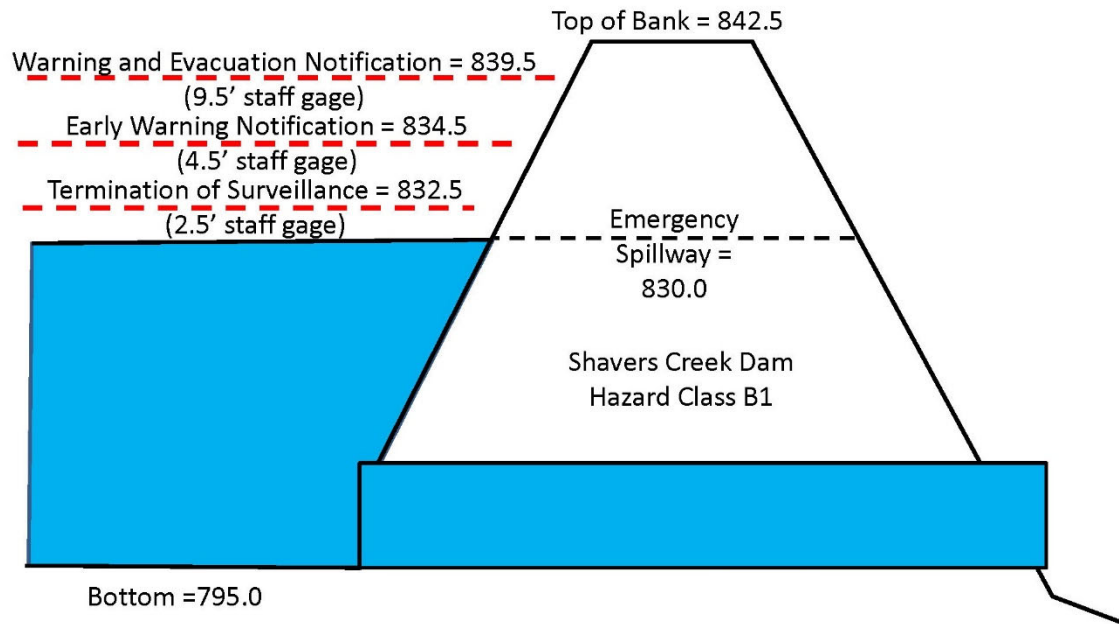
Shavers Creek Dam Water Surface Notification Elevations
